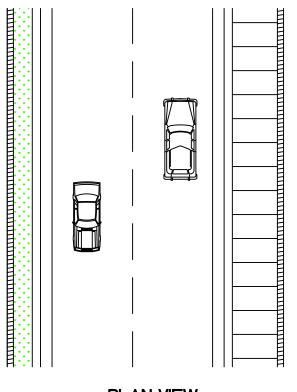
Road Sections (Lost Canyon Road East of La Veda Avenue)
